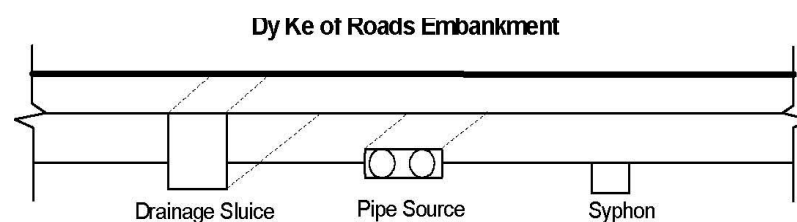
A schematic view of Drainage sluice, pipe sluice and siphon on embankment which relieve drainage congestion.
